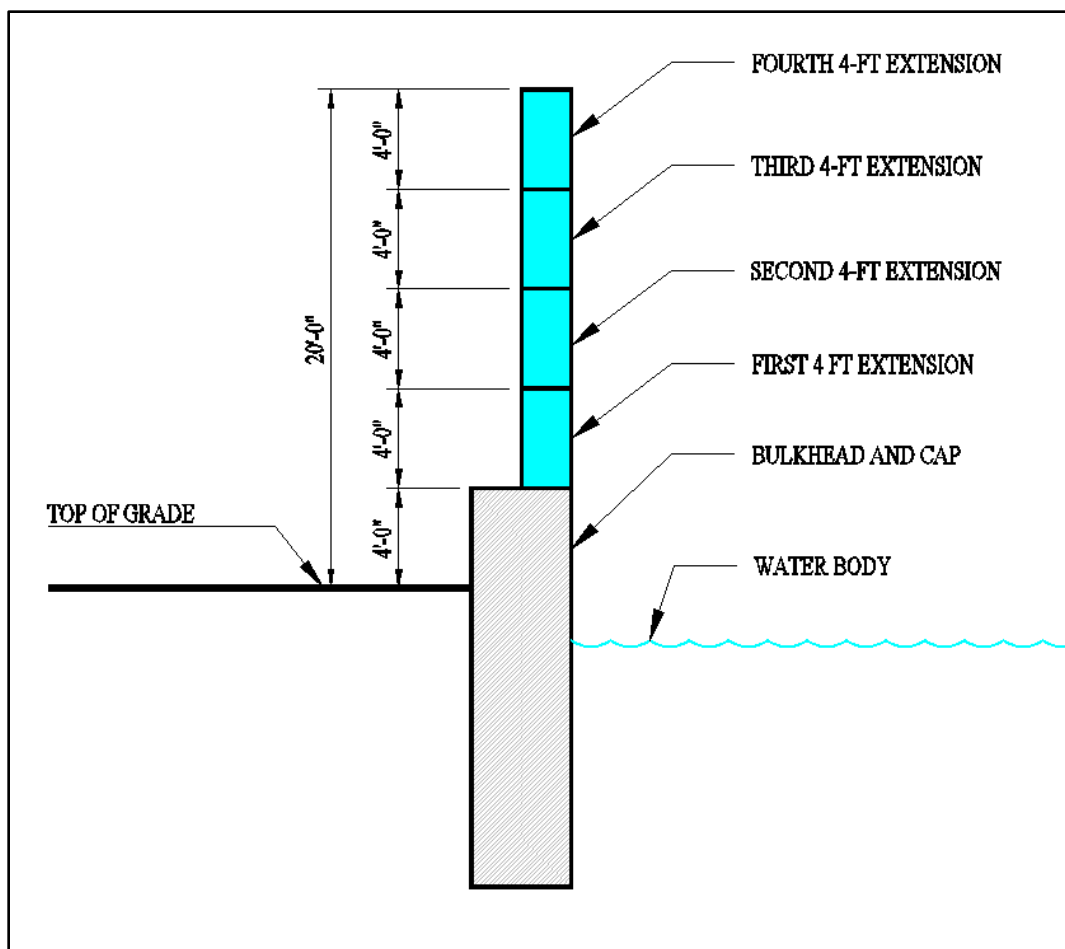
Floodwall Schematic Showing Bulkhead and Extensions
